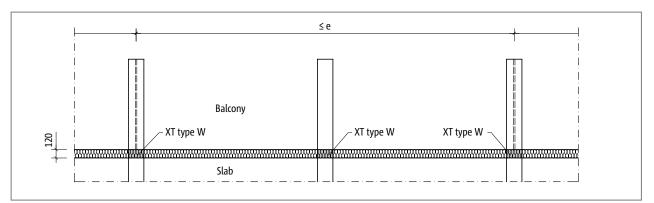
Schöck Isokorb® XT type W: Expansion joint arrangement
